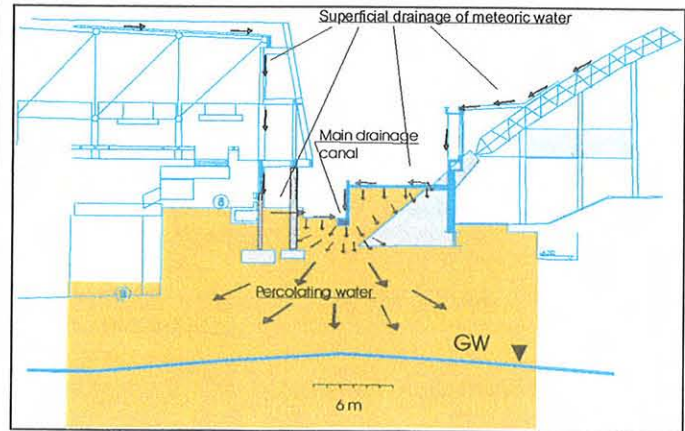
System of the roof water drainage between pit 1 and pit 2. Frequently flooding of the pavement can cause a slight elevation of the groundwater table under the main drainage canal and a rise in the moisture of the earthen constructions in the neighbouring parts of the excavations.
